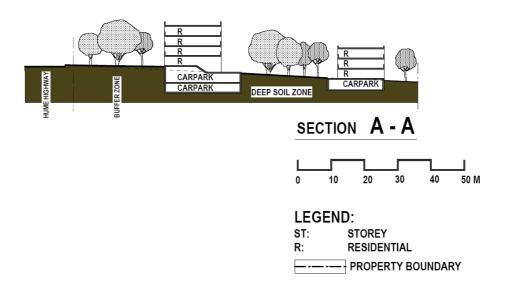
Proposed building envelope for development on the consolidated site as viewed from the Hume Highway (not to scale)
